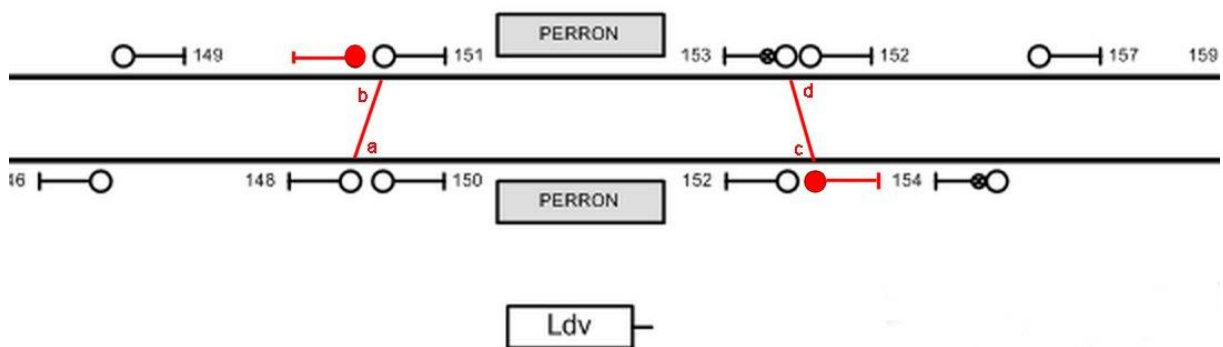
Detailed overview of proposed infrastructure near station Leidschendam-Voorburg (Ldv) (Sporenplan, 2013c; adapted)
